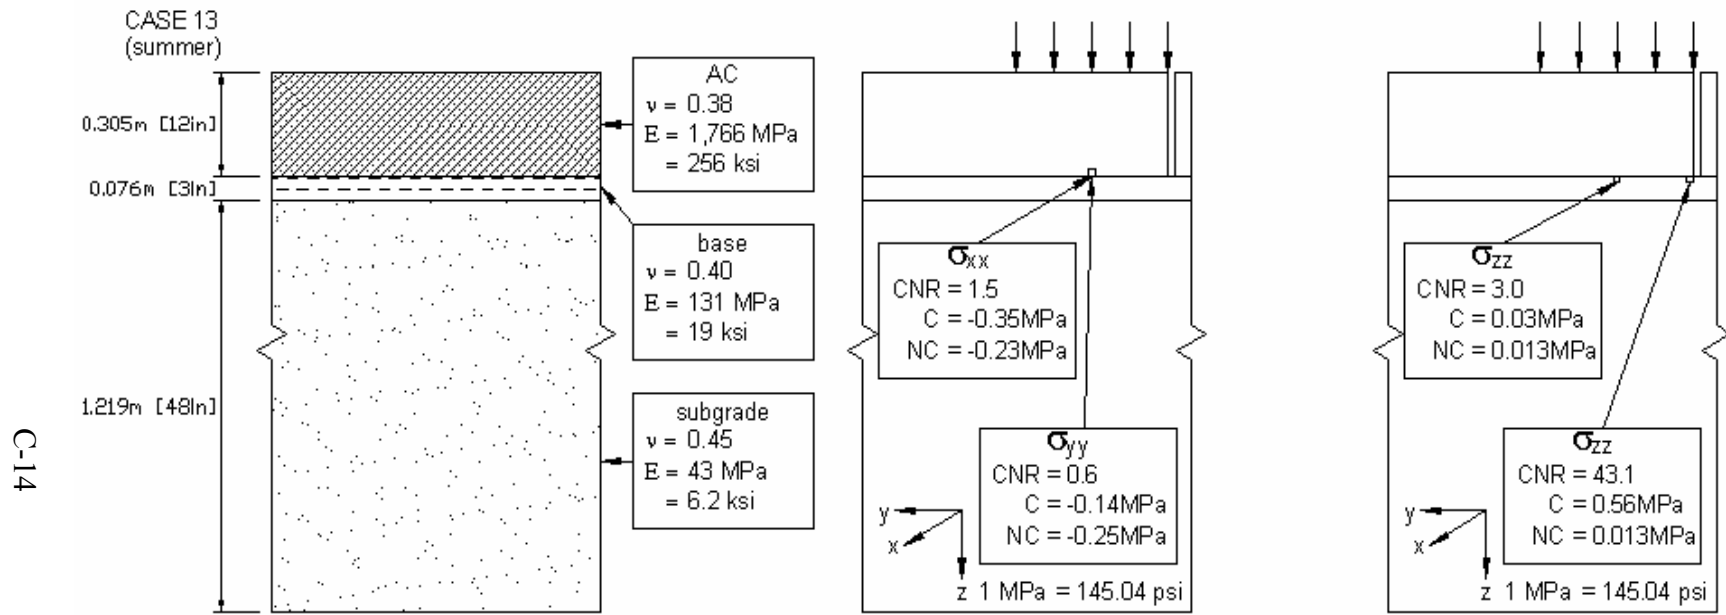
Summary cross section for case 13, (C – stress in cracked pavement, NC – stress in pavement with no crack, CNR – crack/no crack (stress) ratio)
